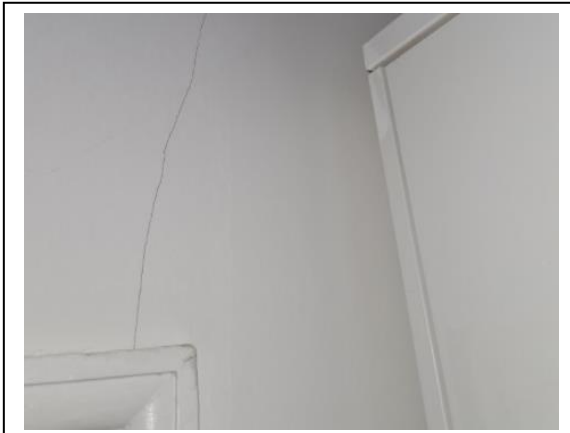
Flat 20 – Kitchen - Cracking above cupboard door
